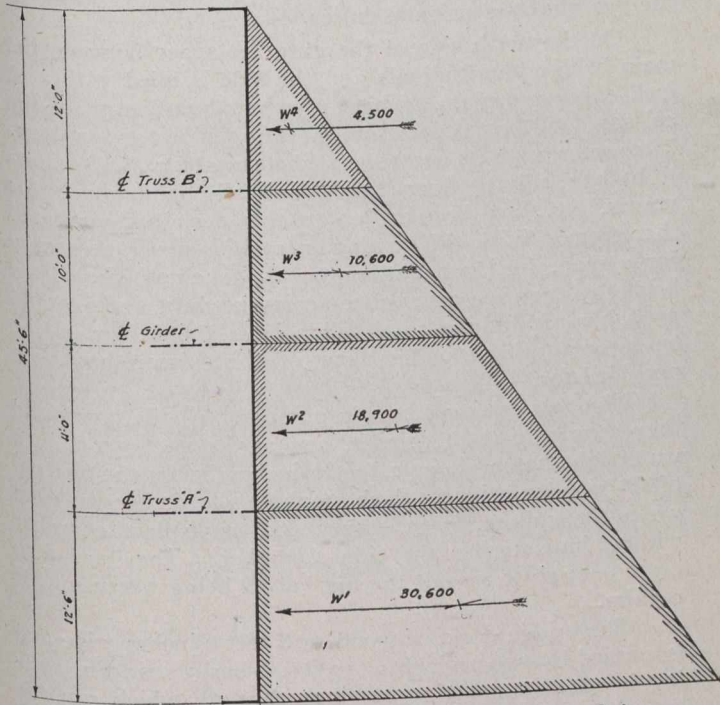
Hydrostatic Loading Against Rolling Caisson.
